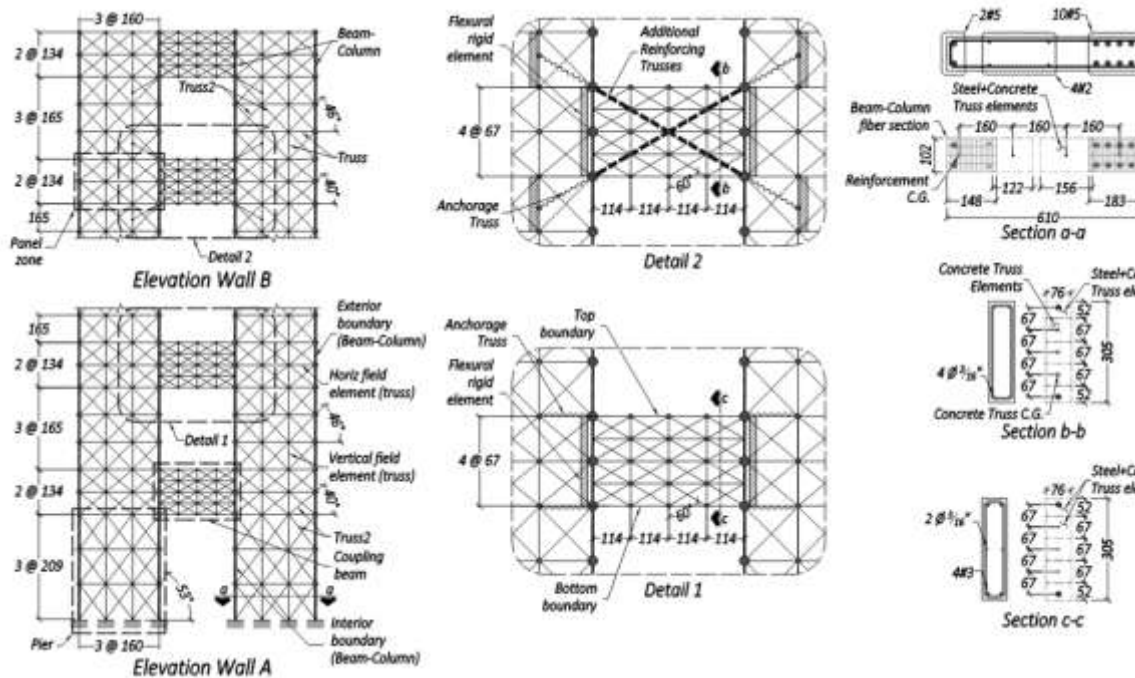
Specific details of the MBTM of the specimens Wall A and Wall B.
